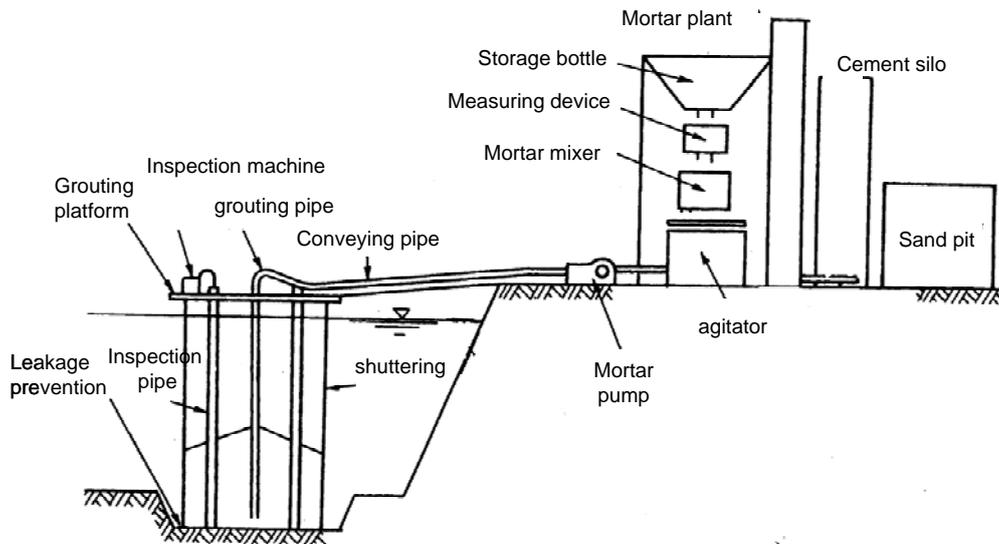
Example of arrangement of construction equipments in grouting of mortar
